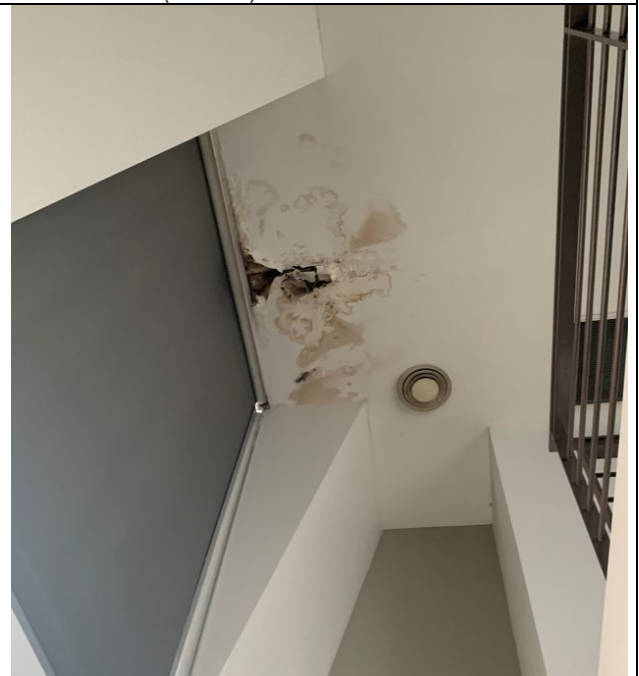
Detail view to water damage to later addition fabric within Unit 90 (Level 6).
